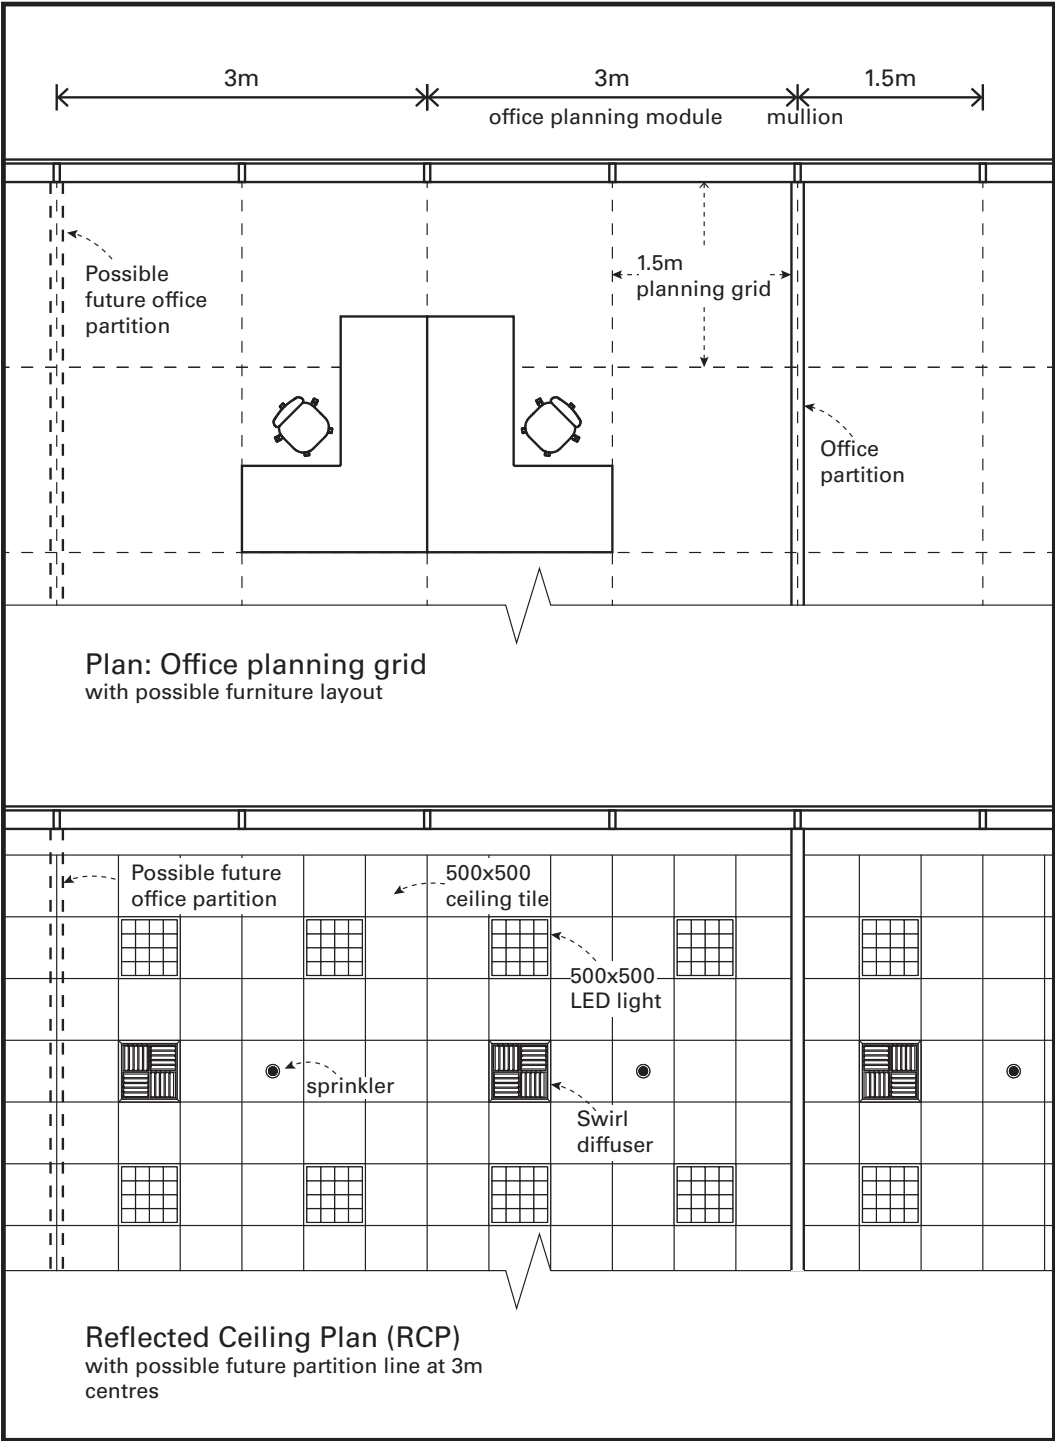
Reflected ceiling plan relationship to planning grid below
